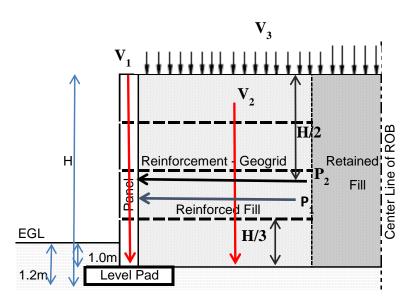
Vertical and Horizontal forces acting in RE Wall Earth pressure due to Surcharge
